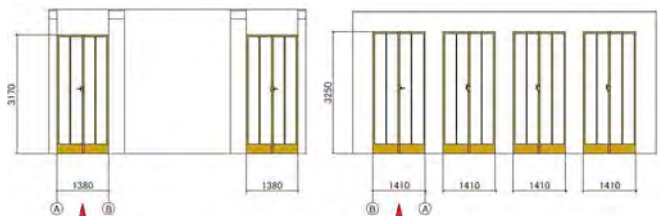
Left, Hall. Right, Dining Room. A and B explain the where the door is facing
